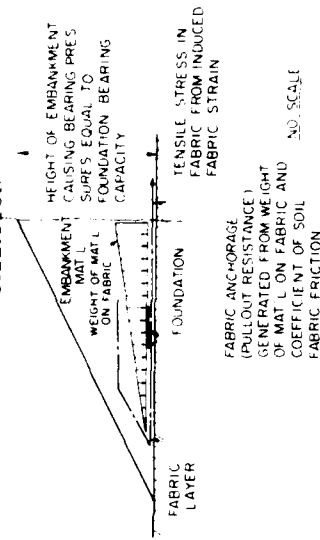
Potential Failure Mode that Might Occur for Fabric-Reinforced Embankments¹
